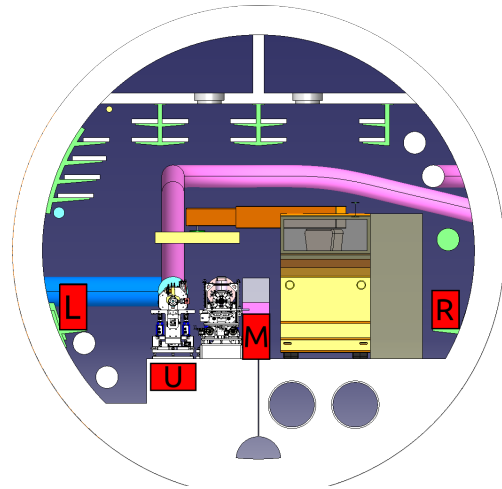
CLIC tunnel cross section<sup>1</sup>.
